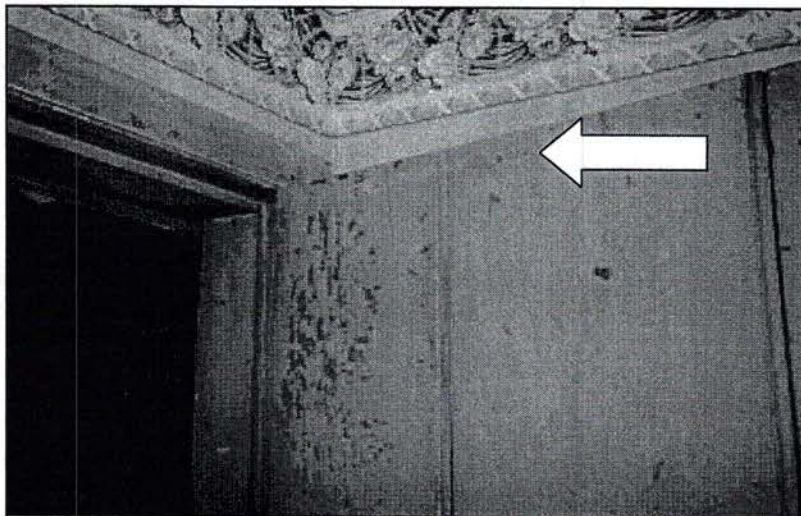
Ghost of a strap hinge on the recycled, hand planed, board and batten door to Room 208.
